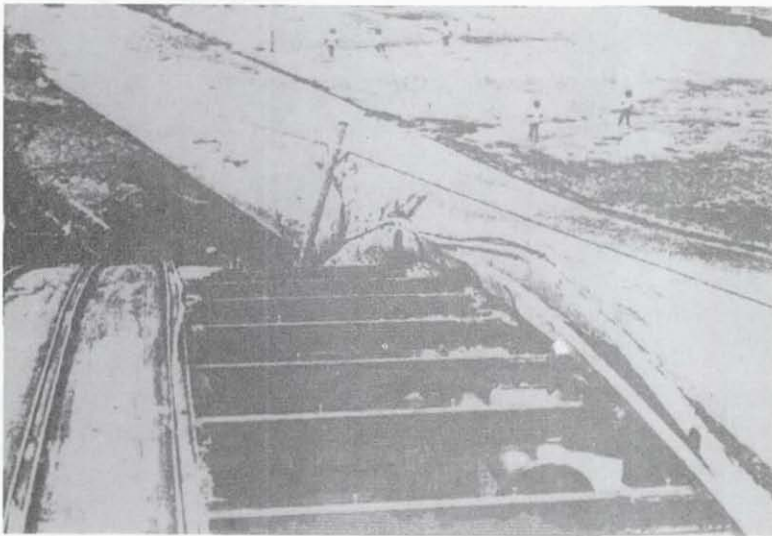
CLOSE UP OF GYMNASIUM DAMAGE
